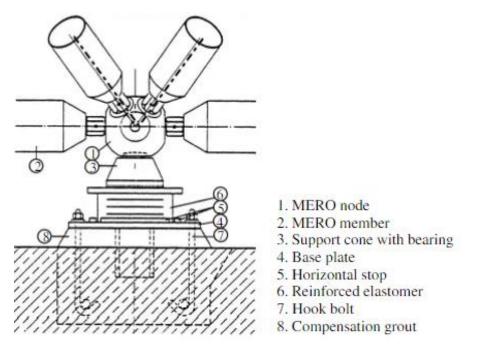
Sketch showing the Bearing joint resting on a laminated elastomeric pad ¹²⁶
